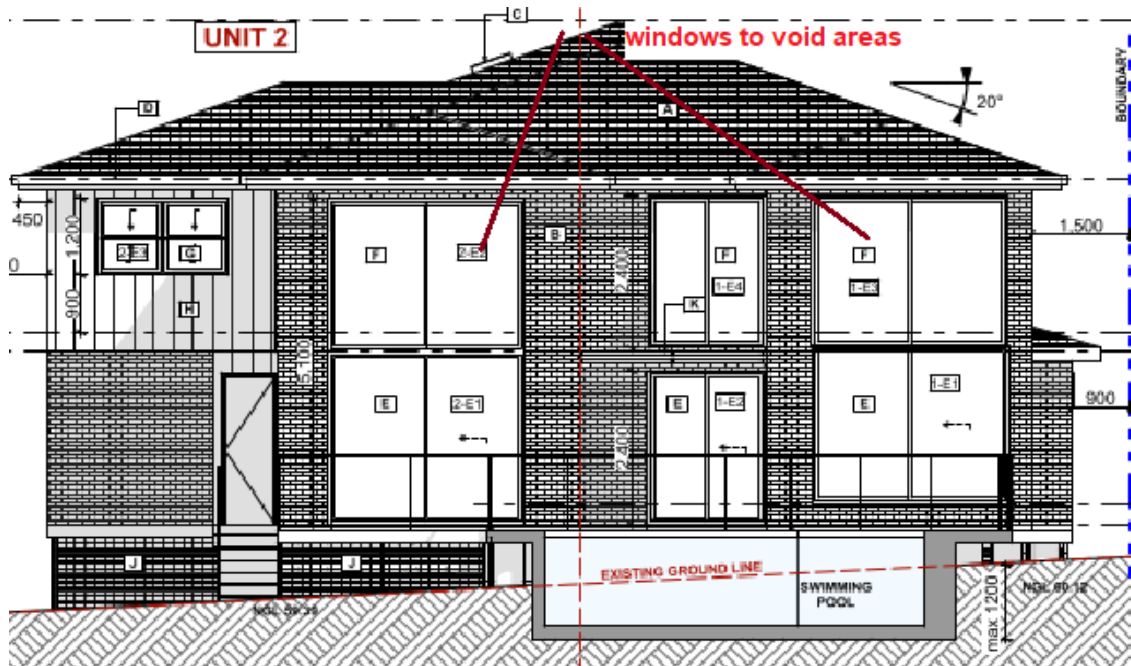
Original Northern elevation illustrating the window over the void area. This will help provide solar into Unit 1 living area
